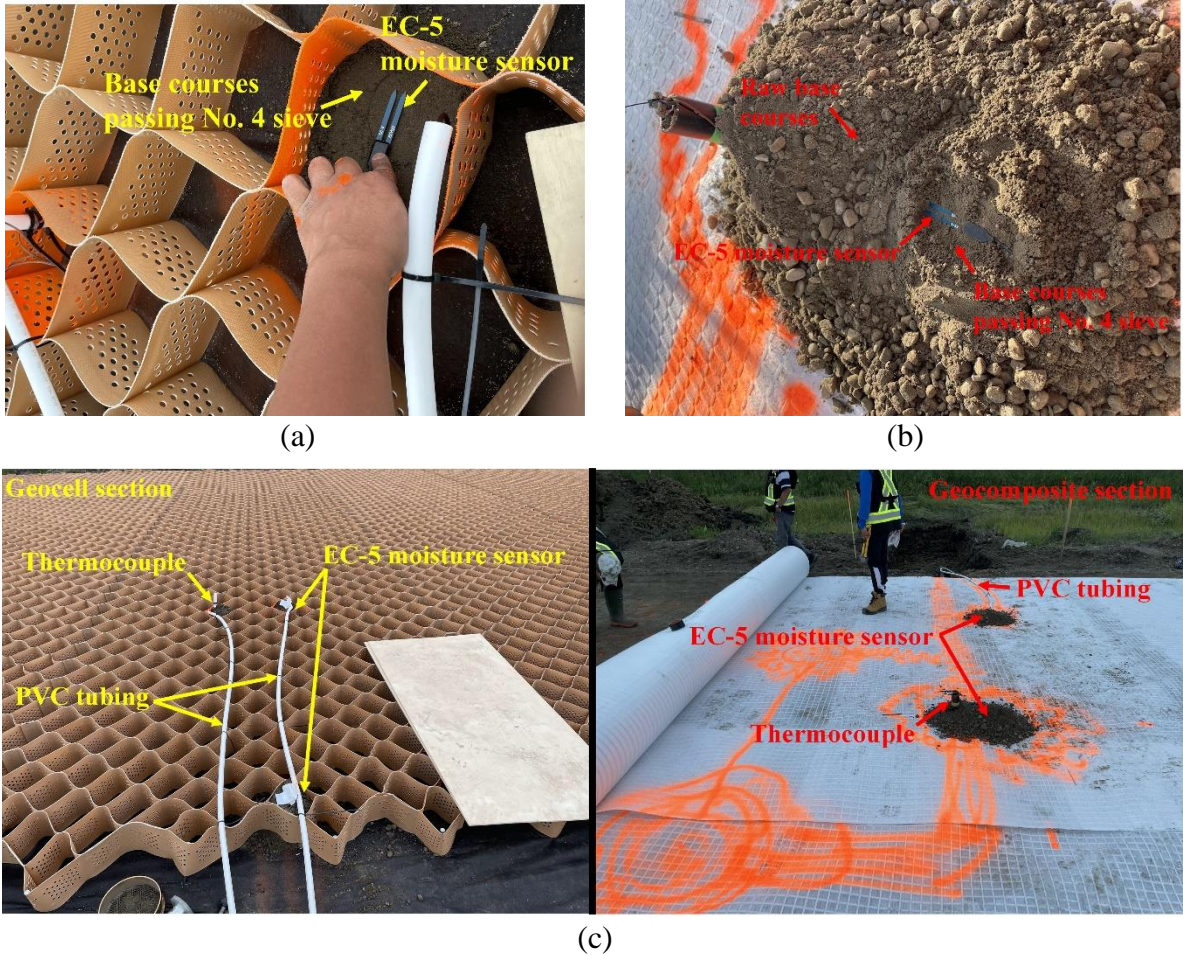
Installation of moisture sensors in the base courses at: (a) geocell sections, (b) geocomposite section, and (c) cable tubing placement
